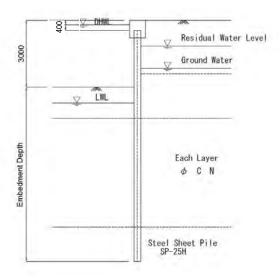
Calculation Model for Steel Sheet Pile
